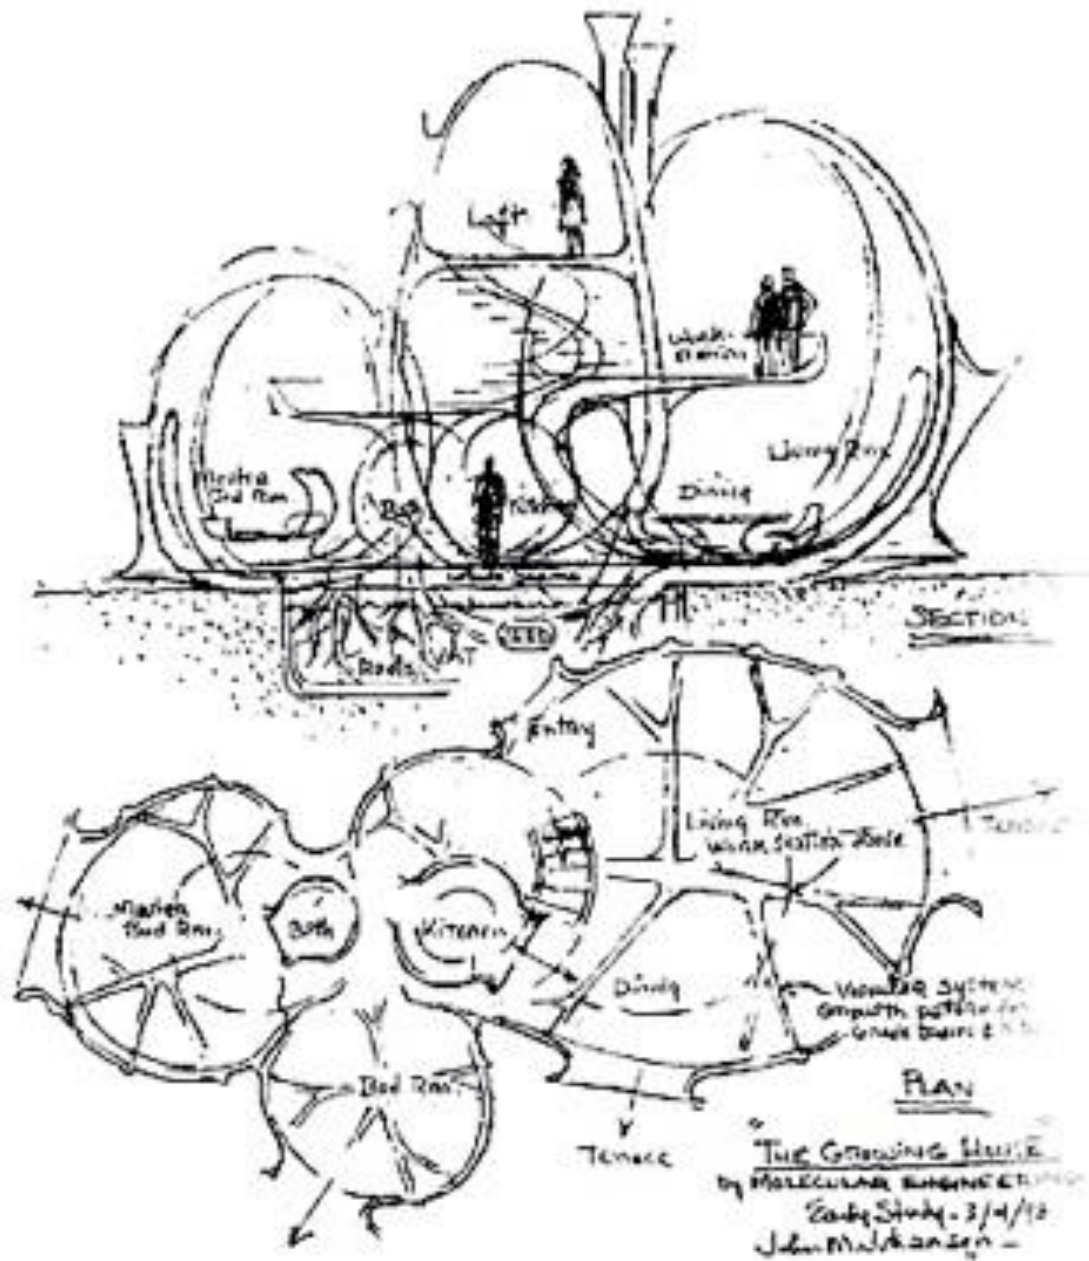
A Plan and longitudinal section of the growing molecular-engineered house.
